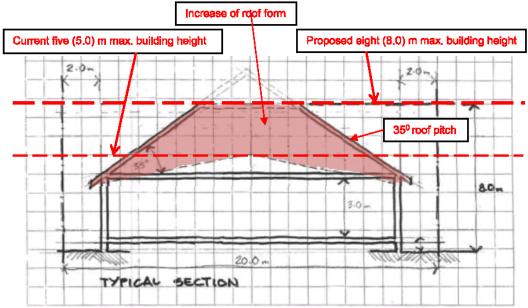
Shaded roof shape indicates the potential increase of building form @ 35° roof pitch
